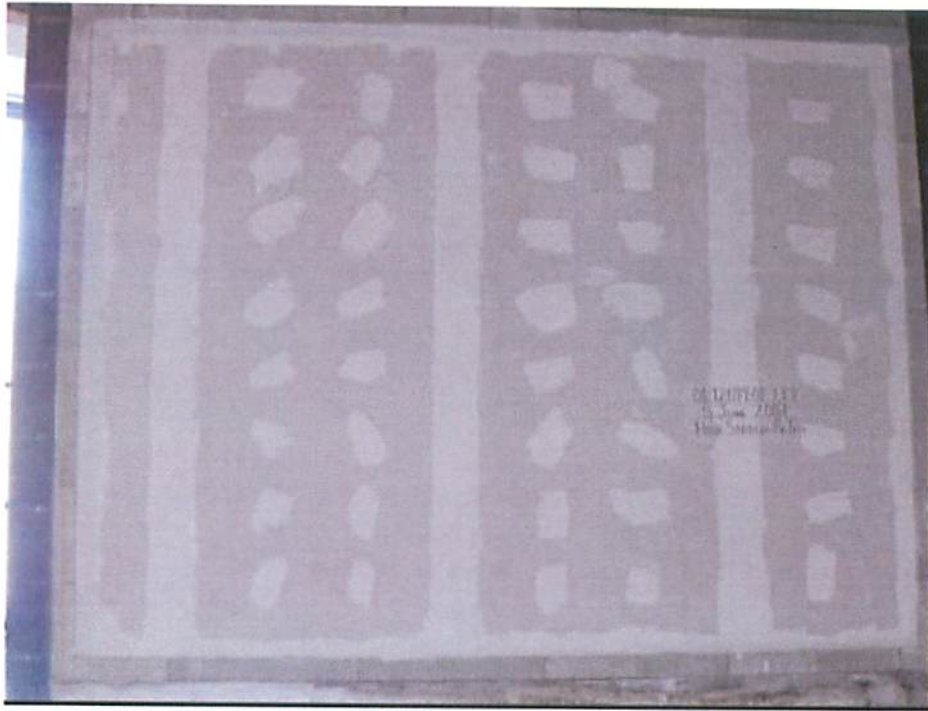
Exposed Side of Hose Stream Retest Prior to the Fire Test.
